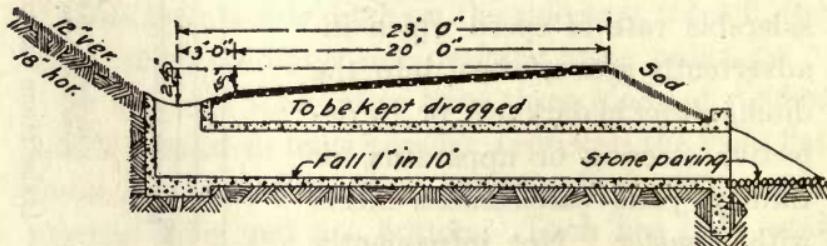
Culvert under a side-hill road to carry the water from the ditch on the upper side.
